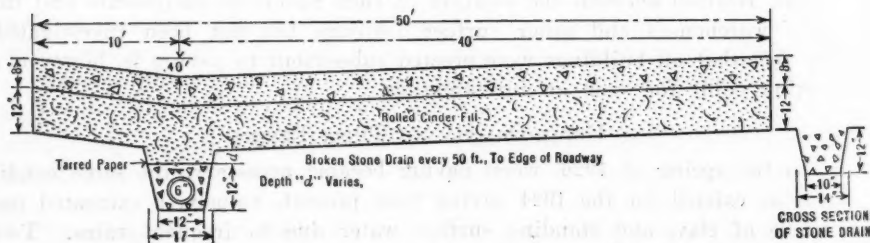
CROSS-SECTION OF ONE-HALF OF 100-FOOT CONCRETE PAVEMENT.
